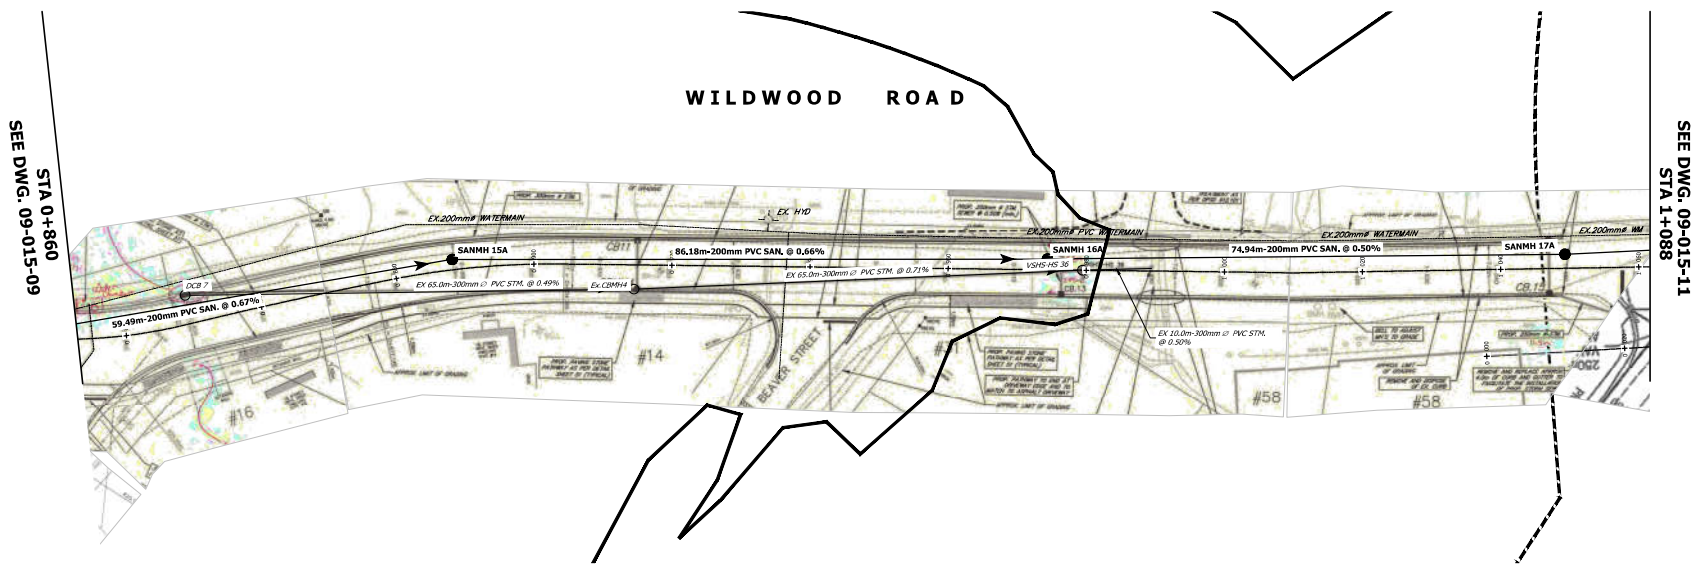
EXTERNAL SANITARY SEWER PLAN AND PROFILE
